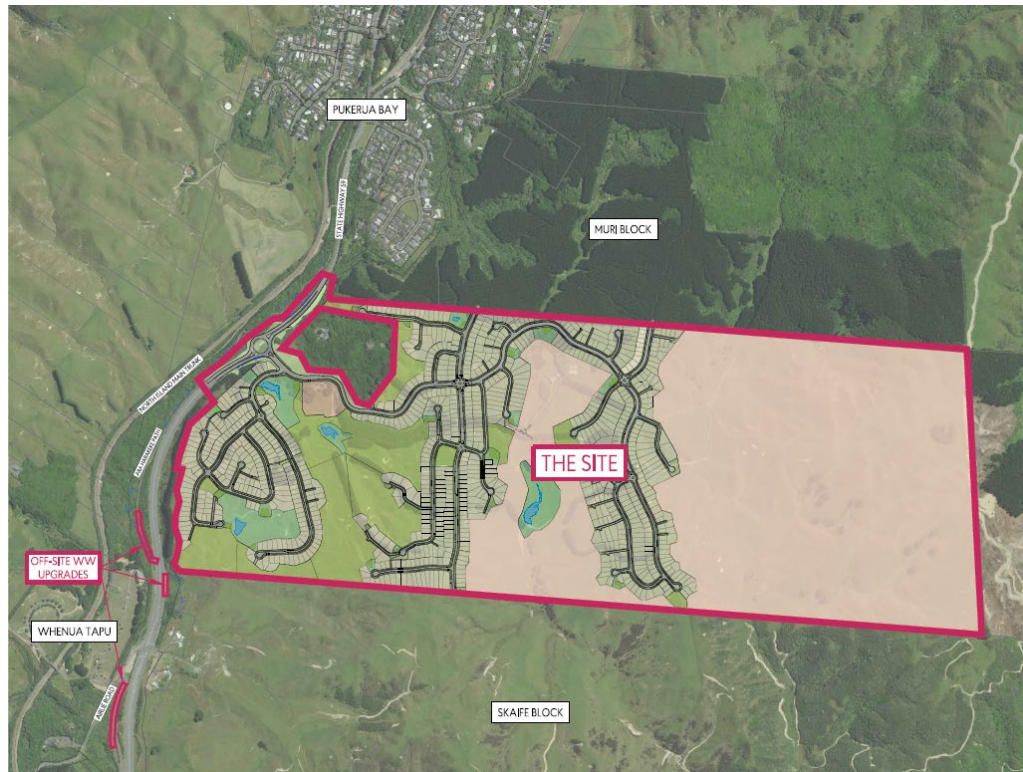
Proposed Site Layout (adapted from Envelope drawing 1753-02-1200-R3)
